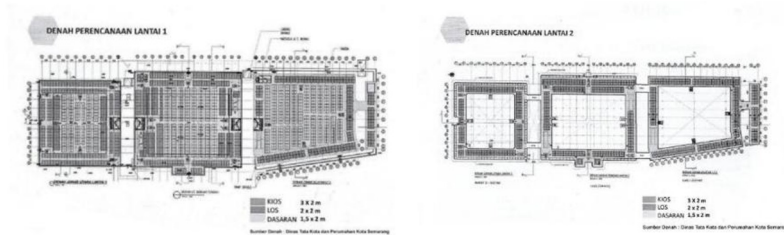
(Left) Pasar Johar's 1st Floor; (Right) Pasar Johar's 2nd Floor Plan (source: Yassin & Sukawi, 2020)
